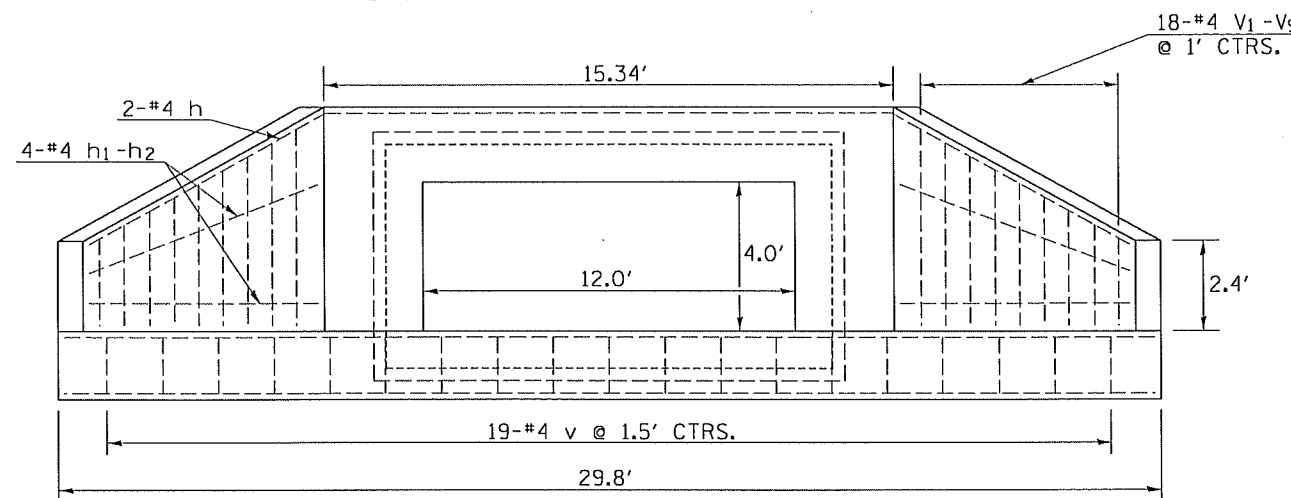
DETAIL OF BOX CULVERT END SECTION STA. 824+77-32' LT. (DOWNSTREAM SIDE)
